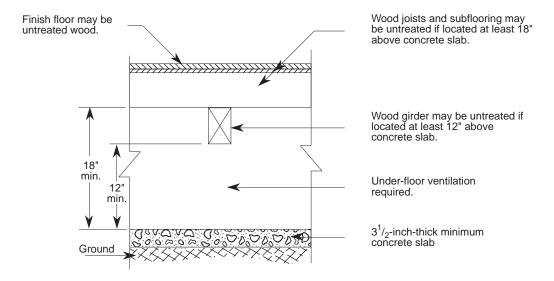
/Raised wood floor over 3¹/₂-inch-thick minimum concrete slab with waterproof membrane
